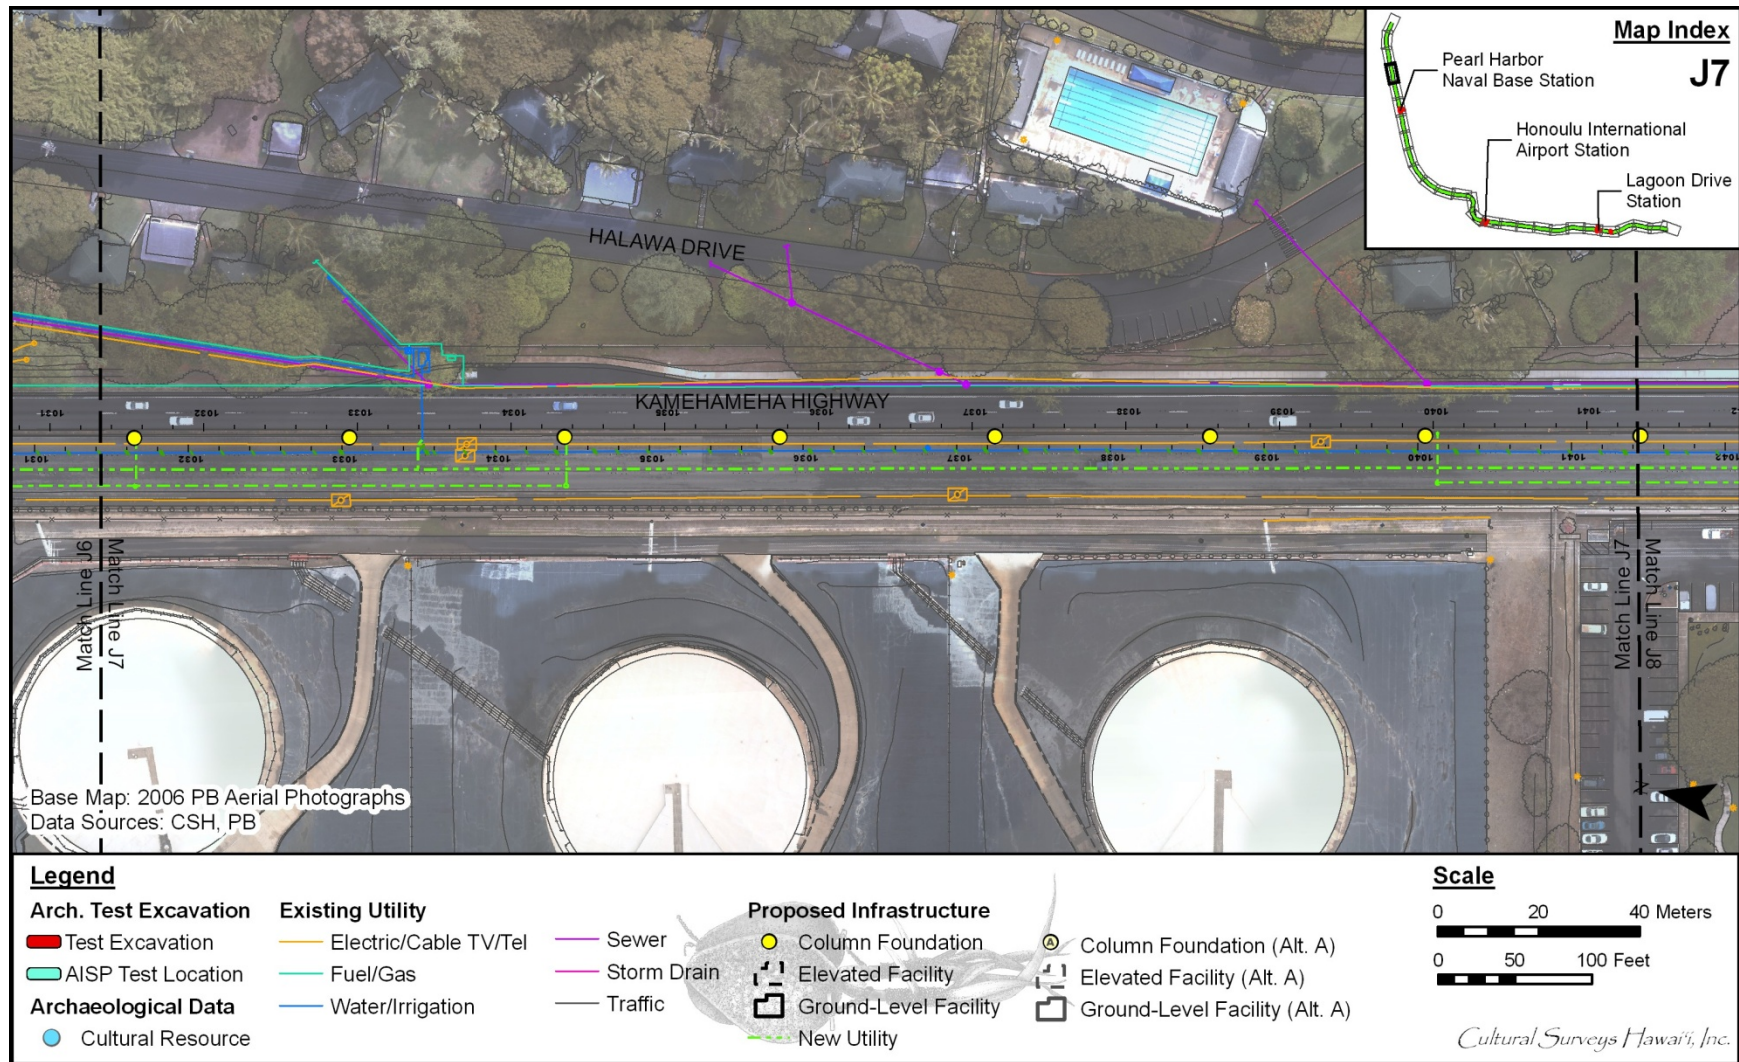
Map Sheet J7, no test excavations due to traffic constraints
